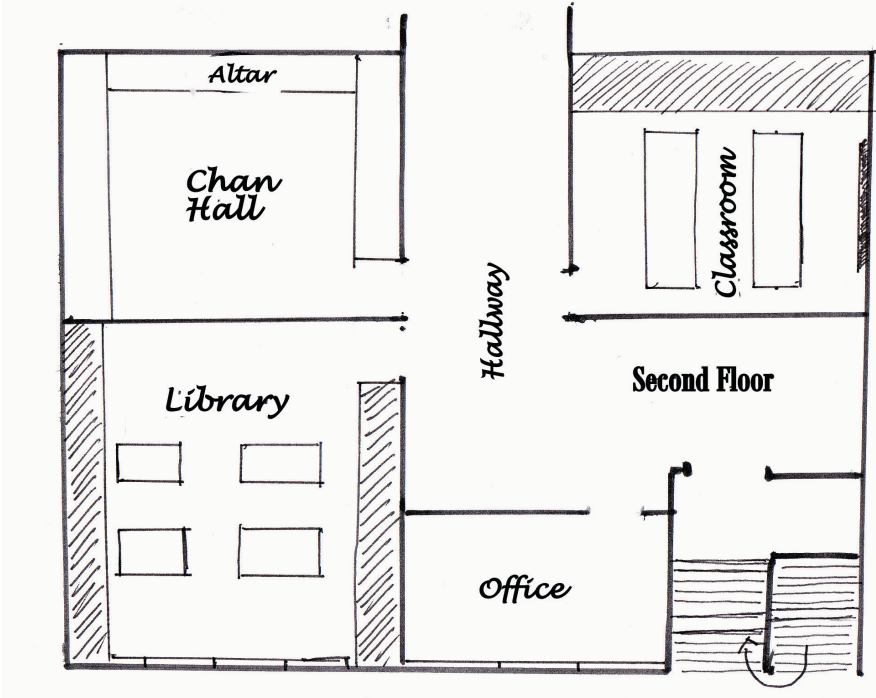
Fo Guang Shan Edmonton, upper floor layout
